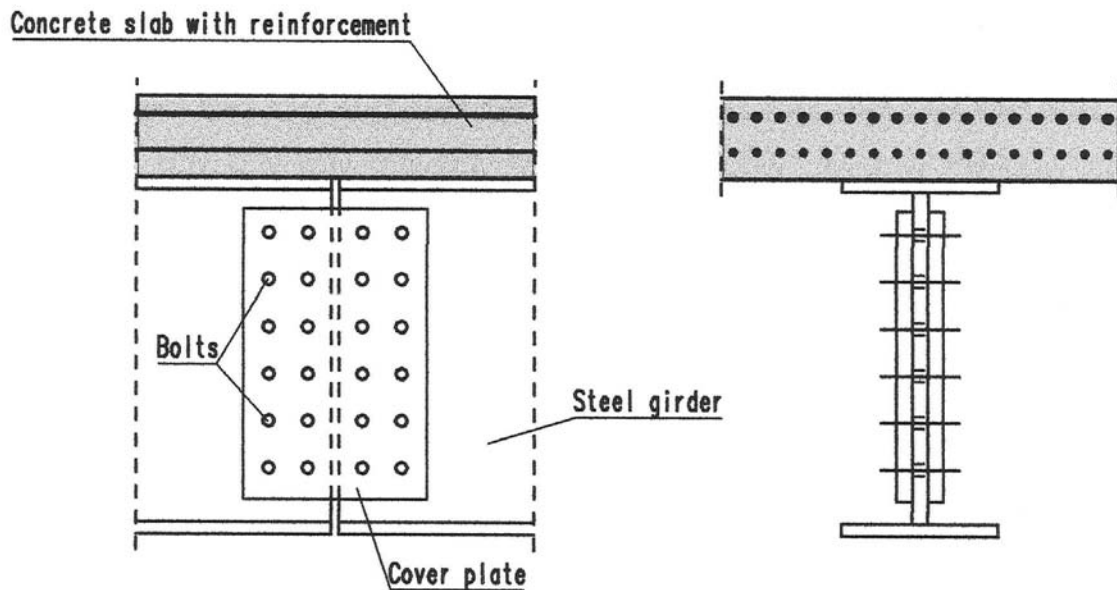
Bolted connection of two girders for multi-beam bridges
